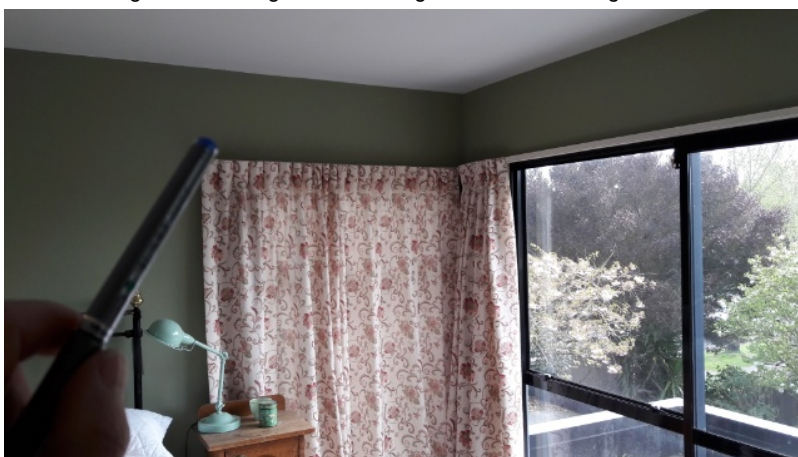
Bedroom 2 -(1) fresh cracking to wall linings
